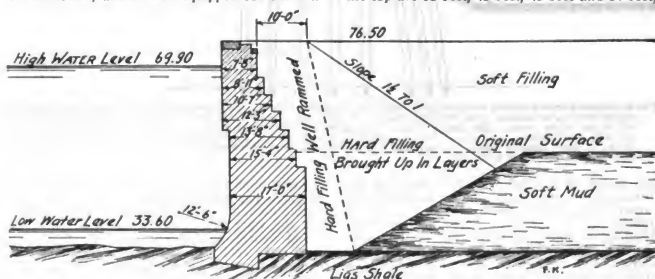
Shows a cross-section of the dock and basin walls at Barry, Wales. This was built of large blocks of mountain limestone, faced with hard red sandstone, and later the walls were backed with various layers of hard and soft fillings, as indicated in the drawing.
